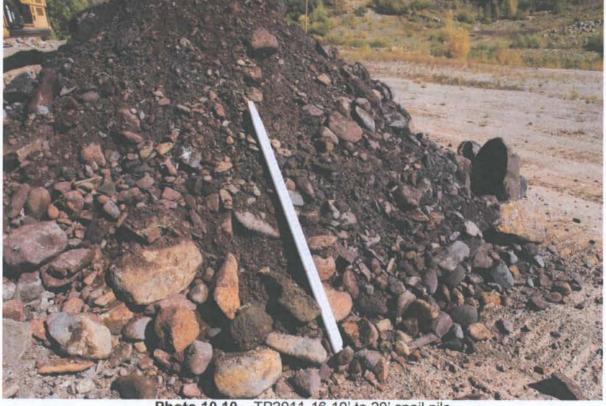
TP2011-16 10' to 20' spoil pile
